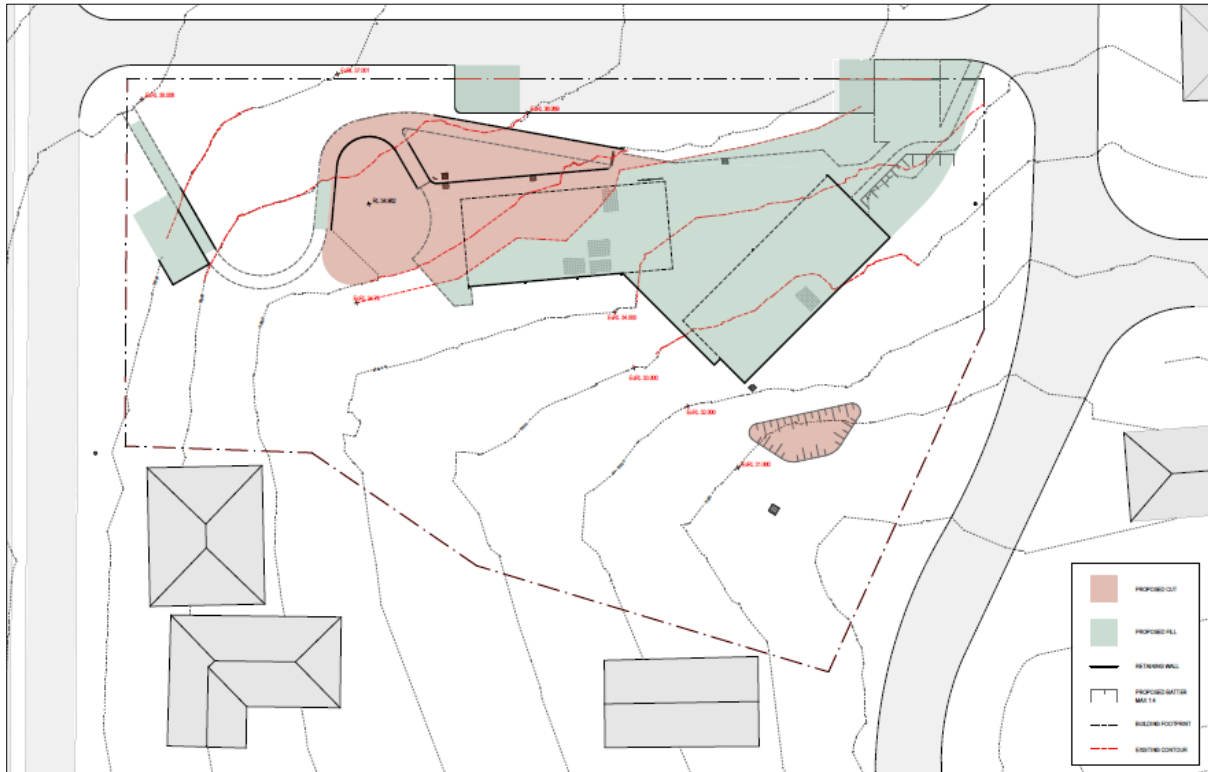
Cut and Fill Plan. Source: AJC Architecture (April 2024)
